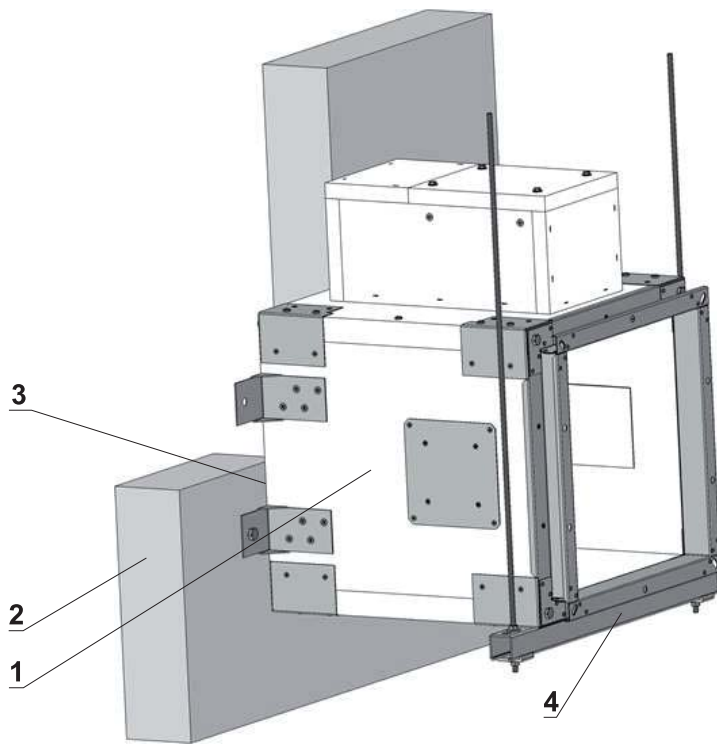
Example of installation in gypsum wall construction of fire compartment - horizontal blade axis position
